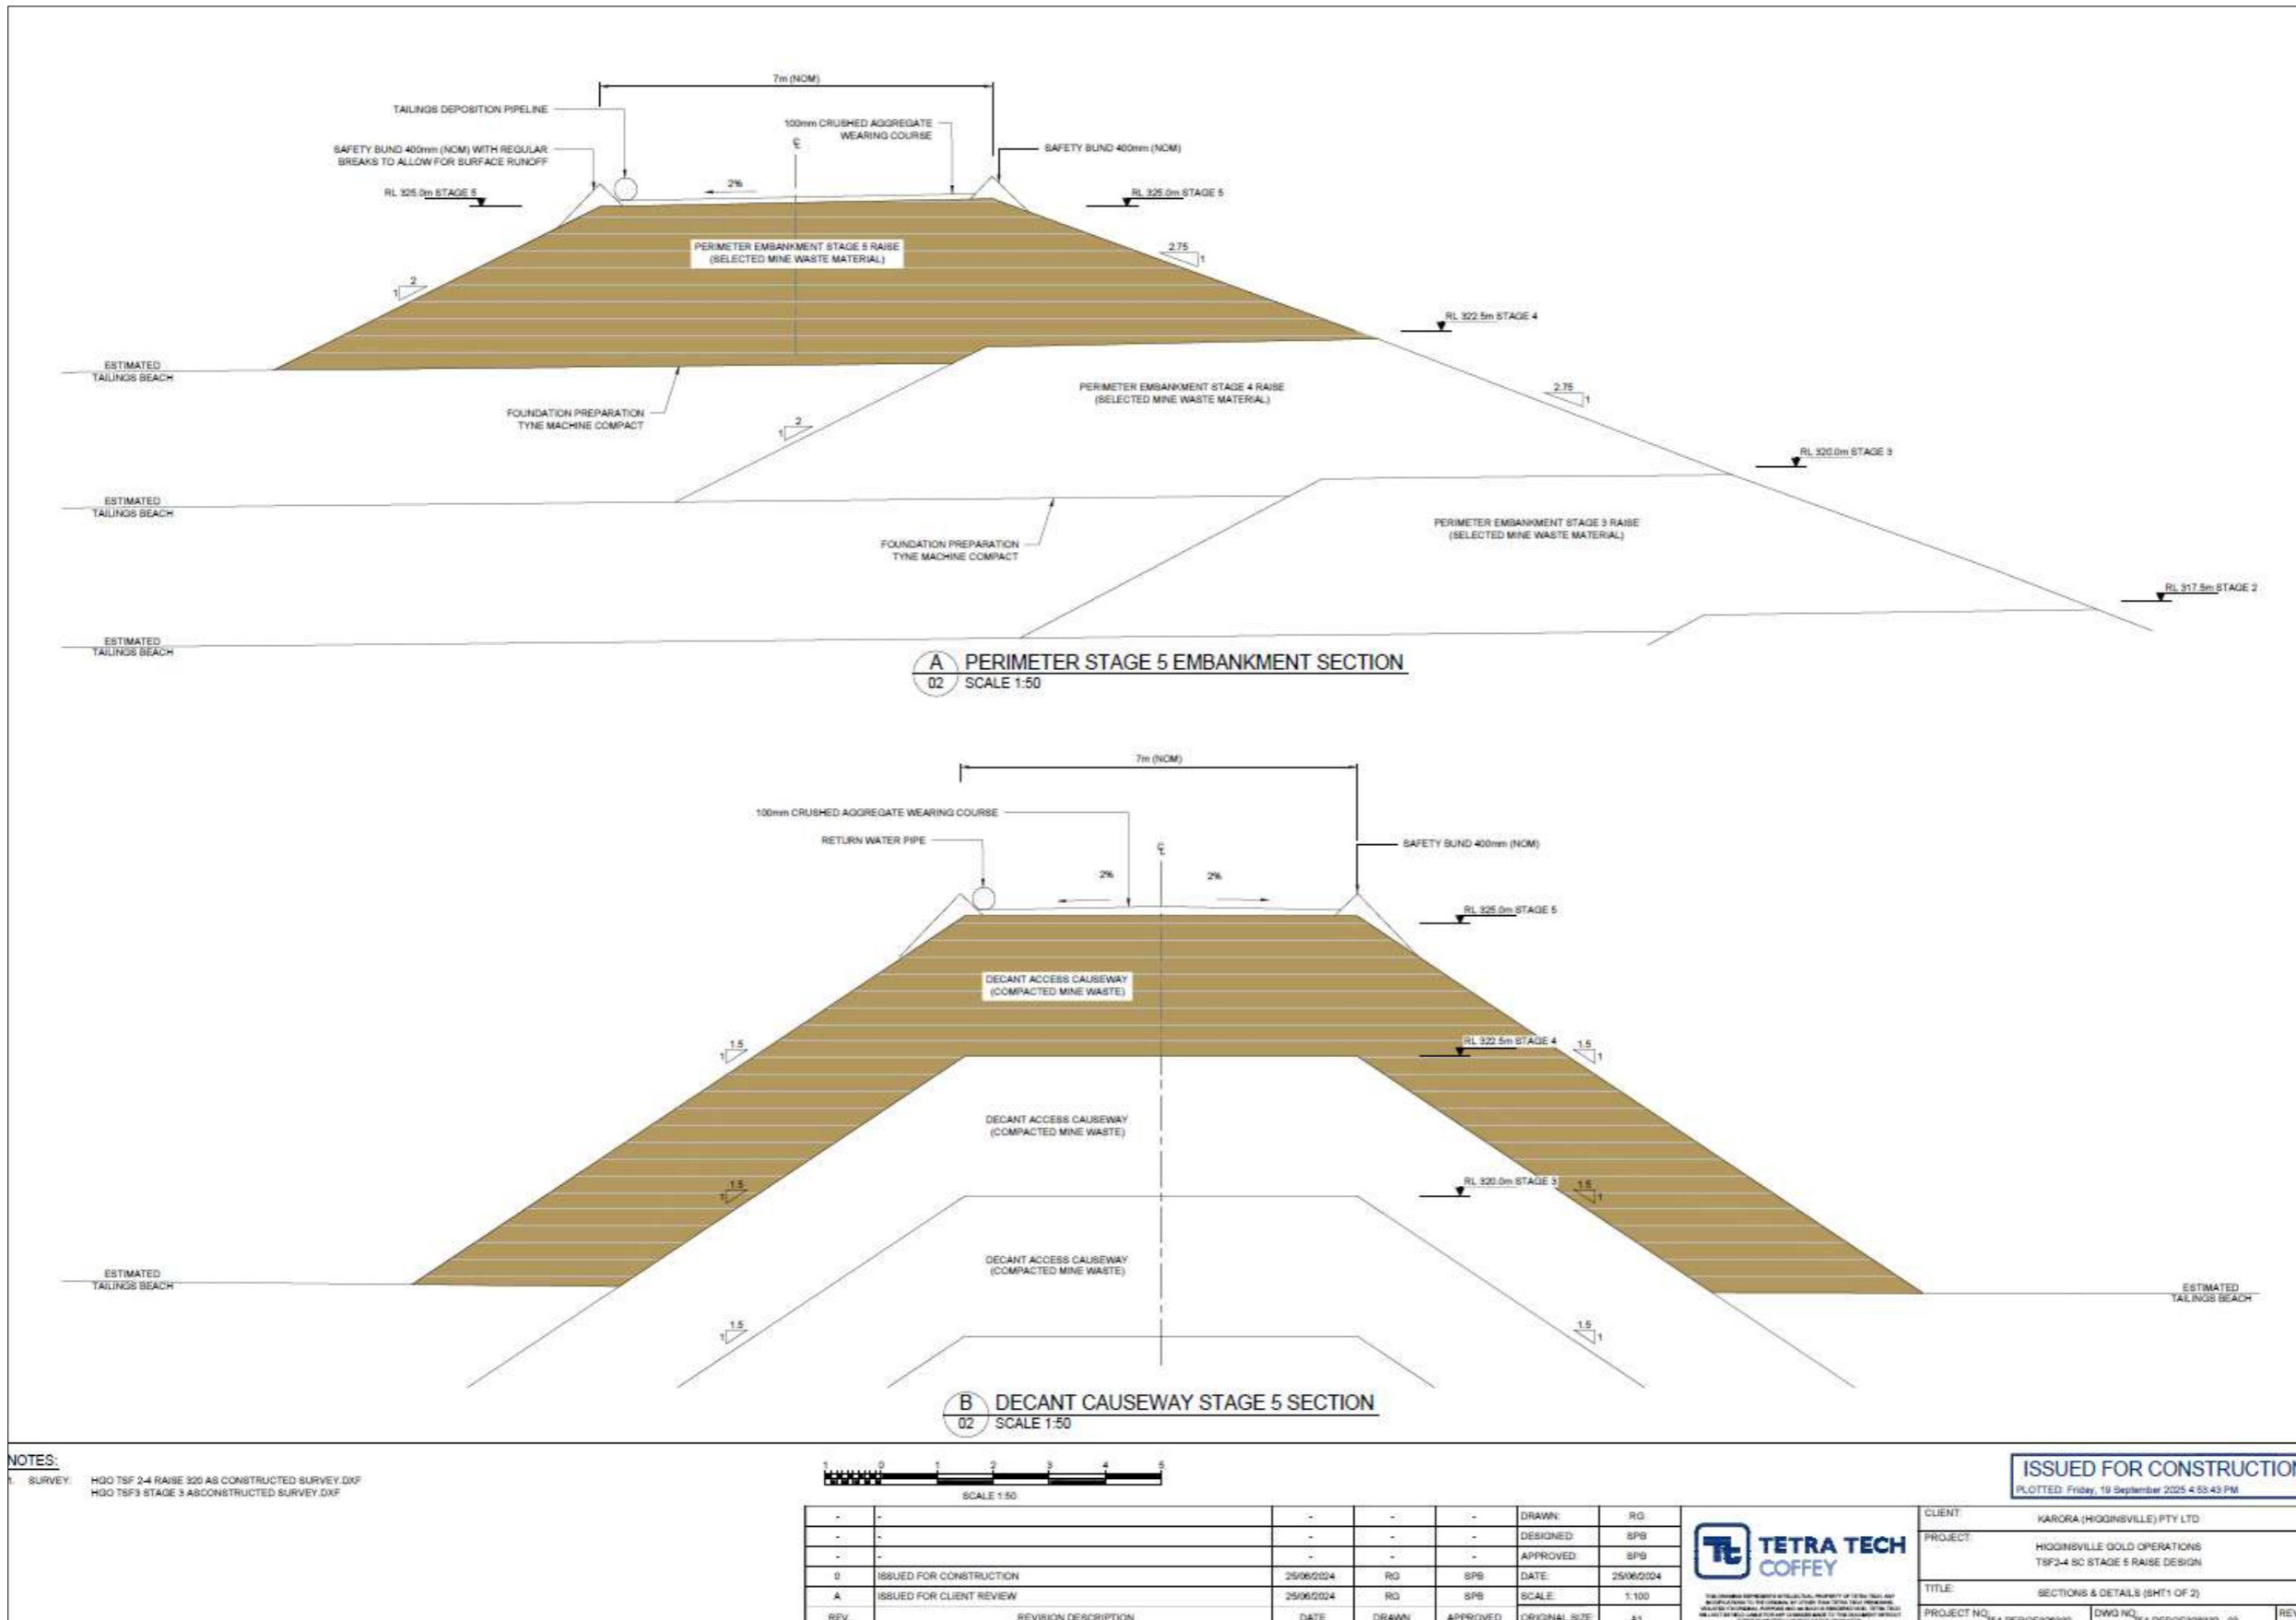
TSF2-4 Stage 5 embankment raise - perimeter and decant causeway design
